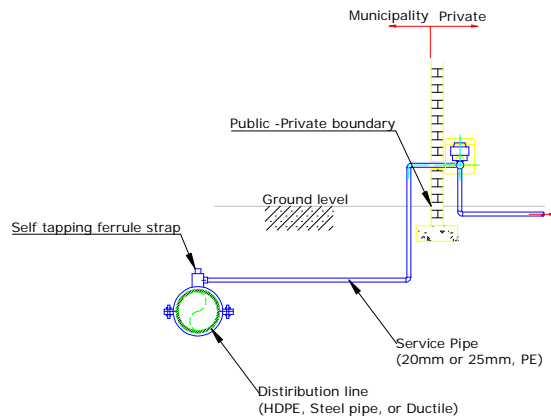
Cross-section view of service pipe route from distribution pipe to domestic water meter
